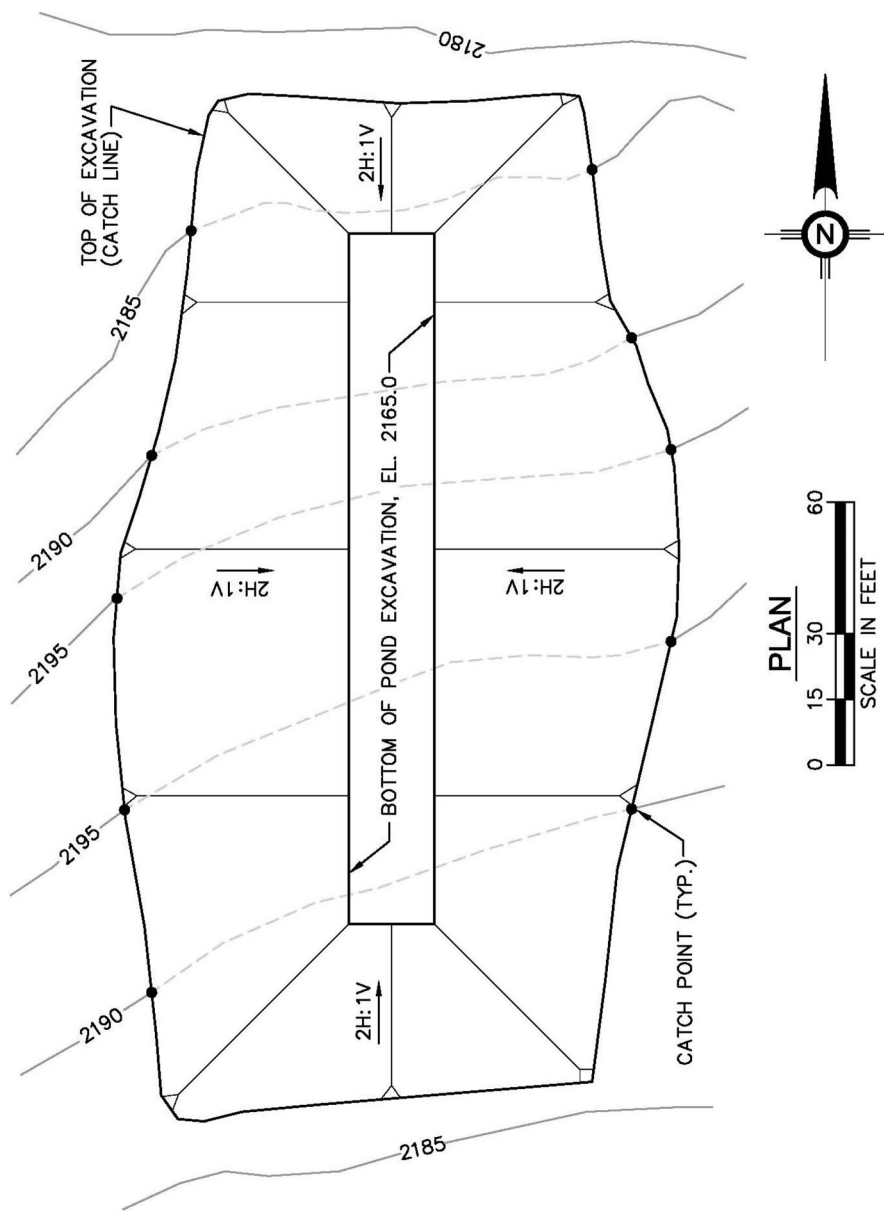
Plan of Pond Excavation Shown Using Slopes and Elevation Method
